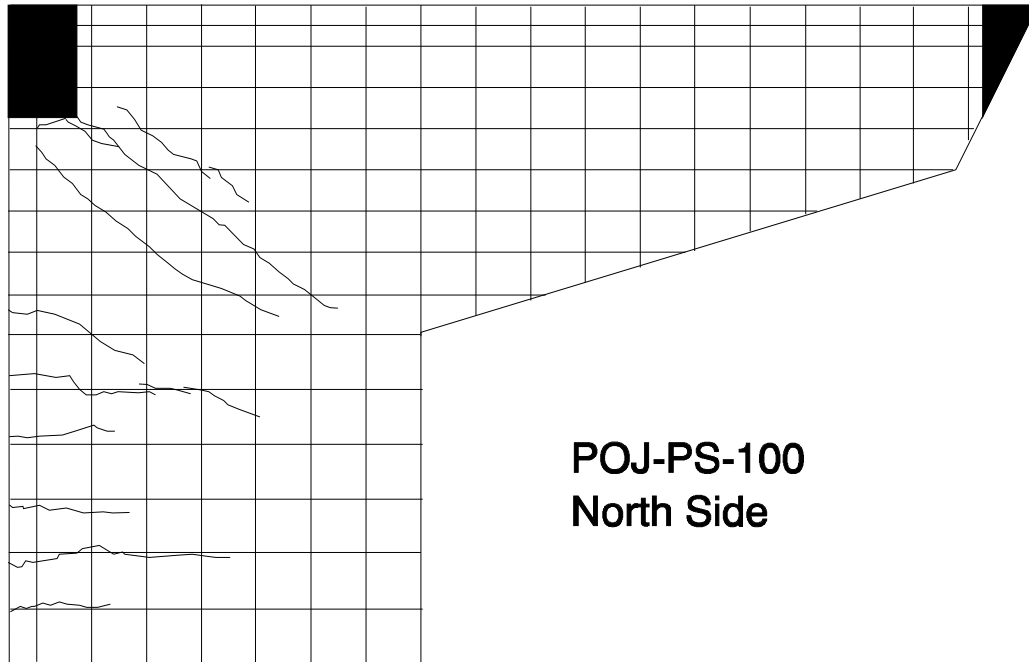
Crack Patterns on Specimen POJ-PS-100 at Dead Load
